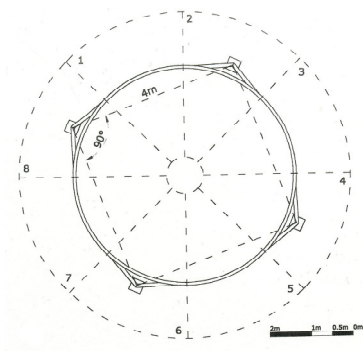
Top view cross-sectional drawing of the steel legs and the floor elements. (Rasier 2002)
